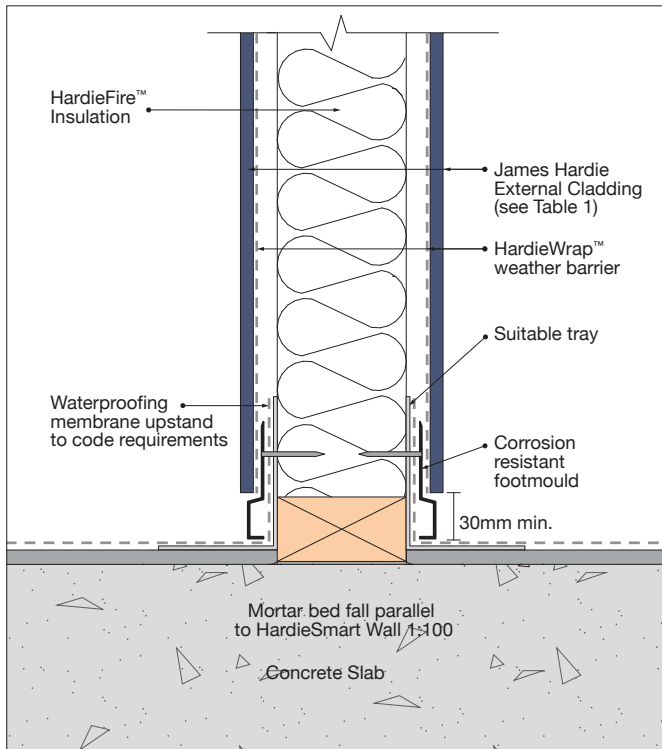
HARDIESMART™ BLADE WALL TO CONCRETE BASE
